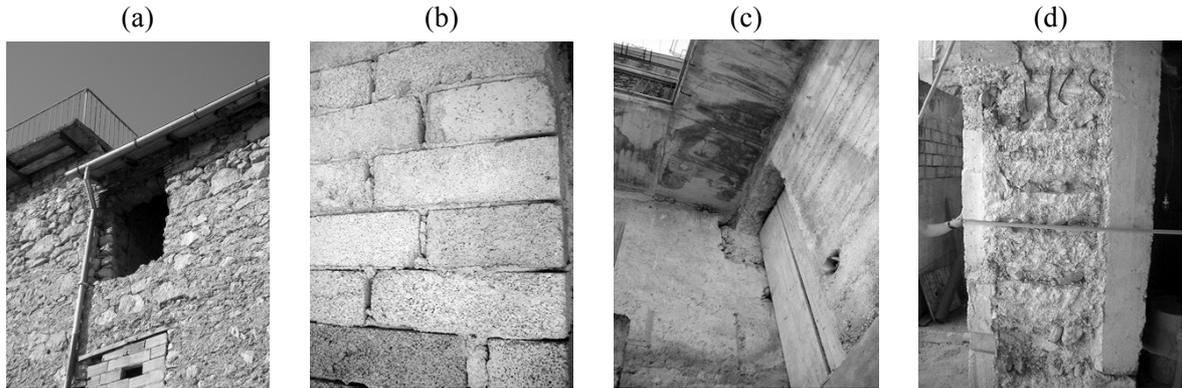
Vertical structure materials observed during the inspection phase. (a) Irregular fabric of stone masonry, (b) light cement blocks, (c) reinforced concrete and (d) reinforced stone masonry
